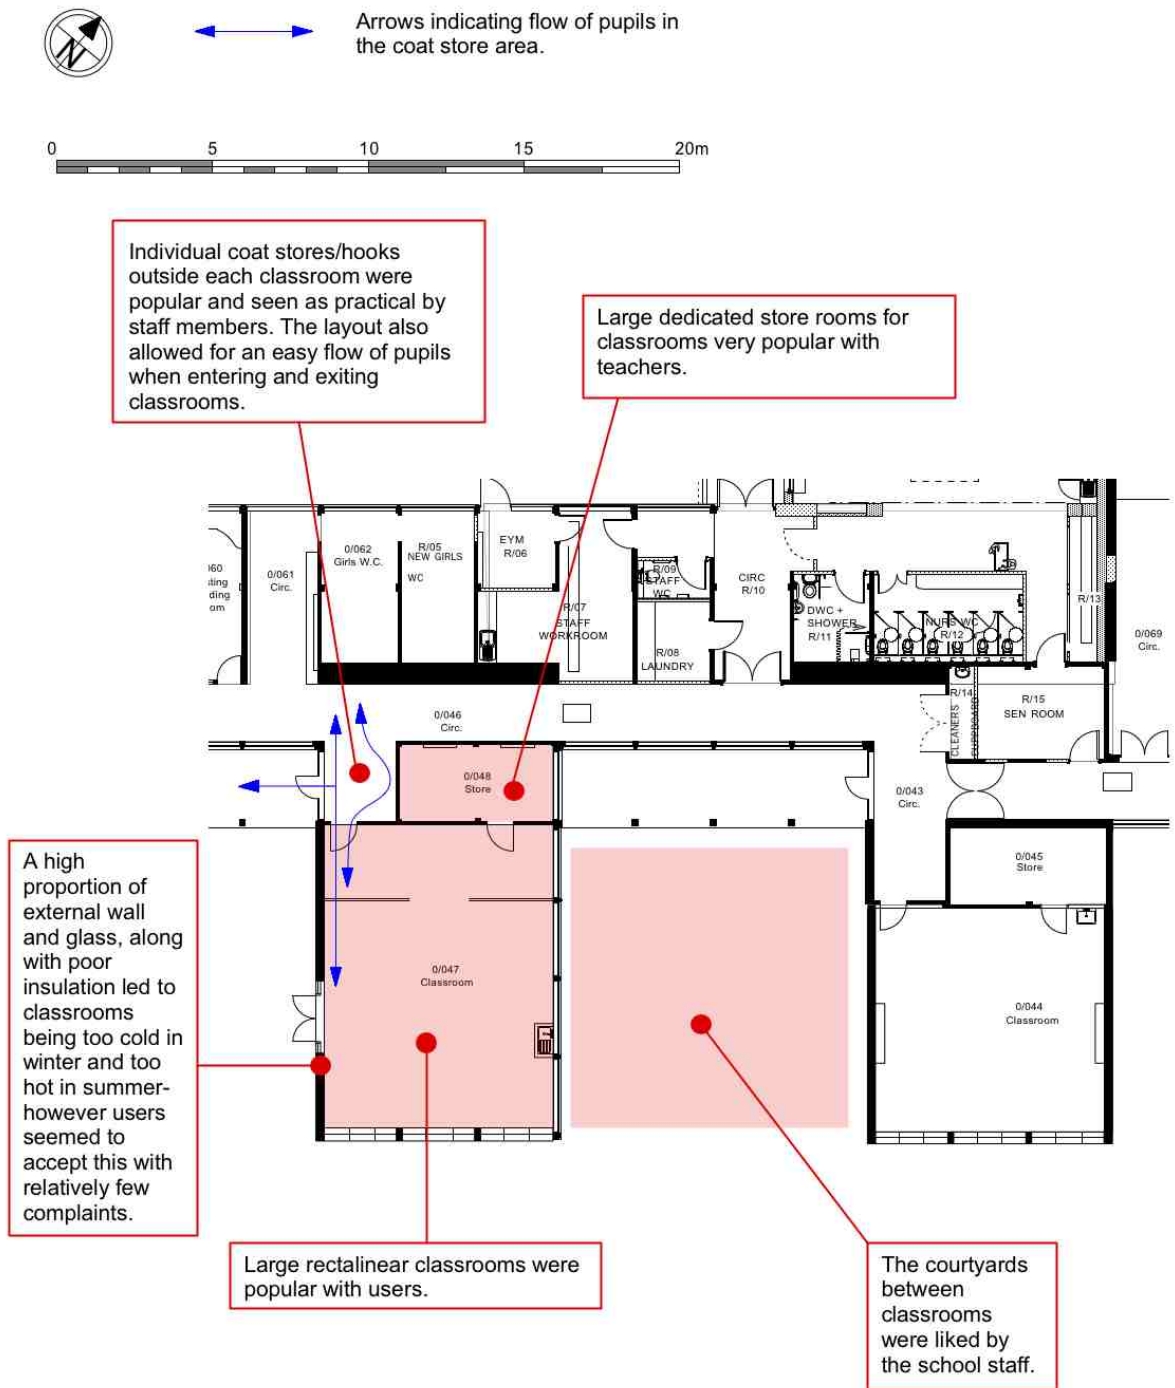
Extract plan from the Ground Floor of the Old Building
